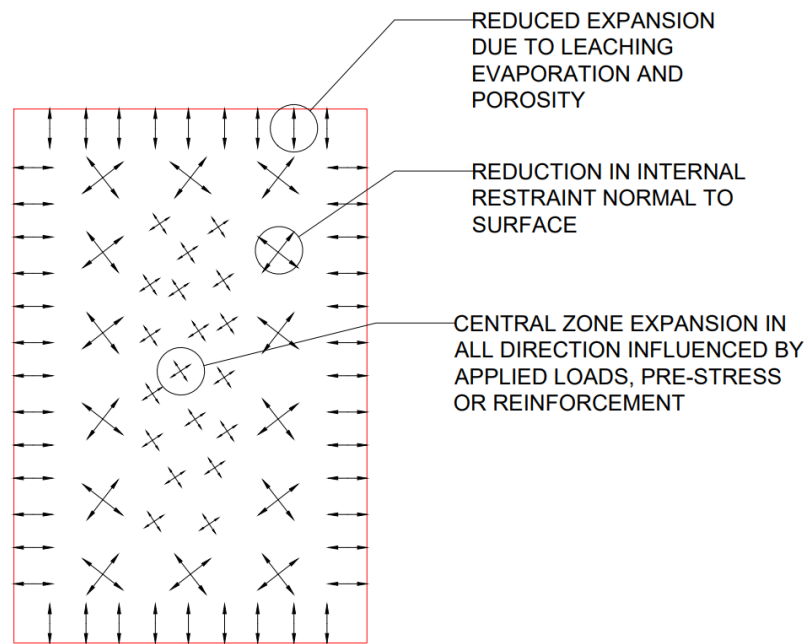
Differential Expansion for ASR affected Concrete Beam Section,
